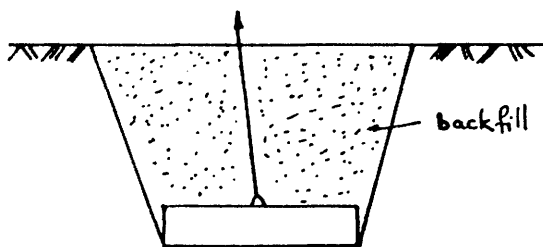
PLATE OR GRILLAGE ANCHOR.
